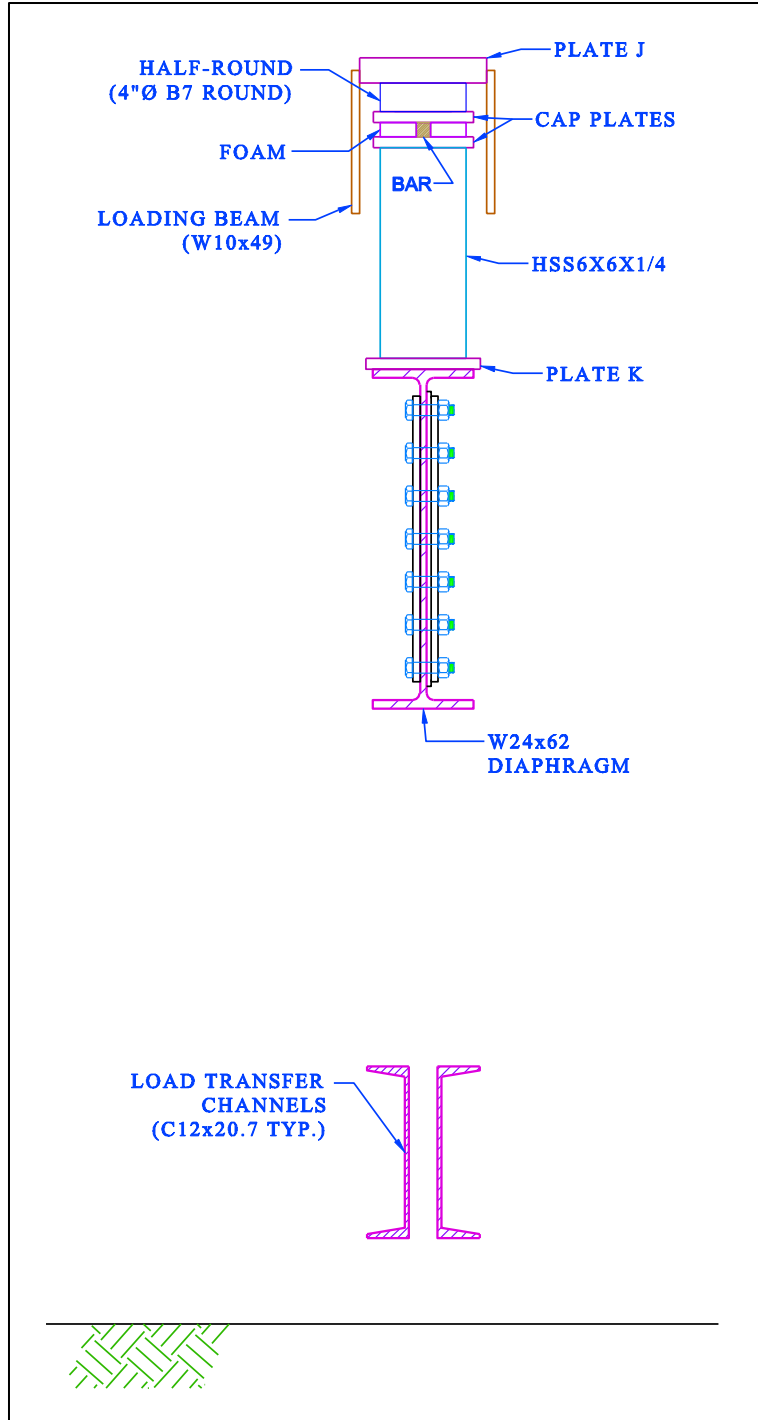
Longitudinal plane cross section view of load bearing assembly at Section A
